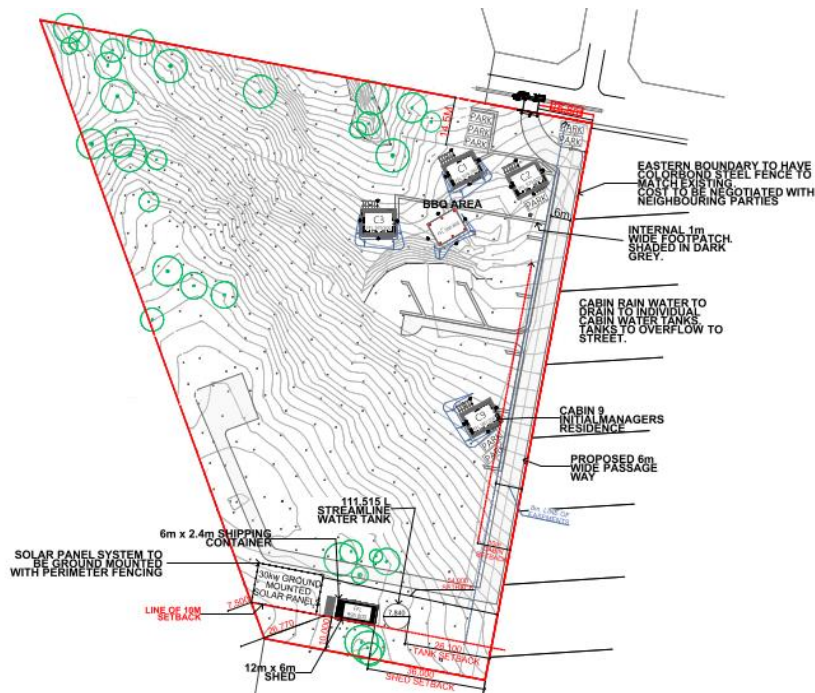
Proposed Site layout – Stage 2 Cabins 2 & 3 and the communal BBQ area
